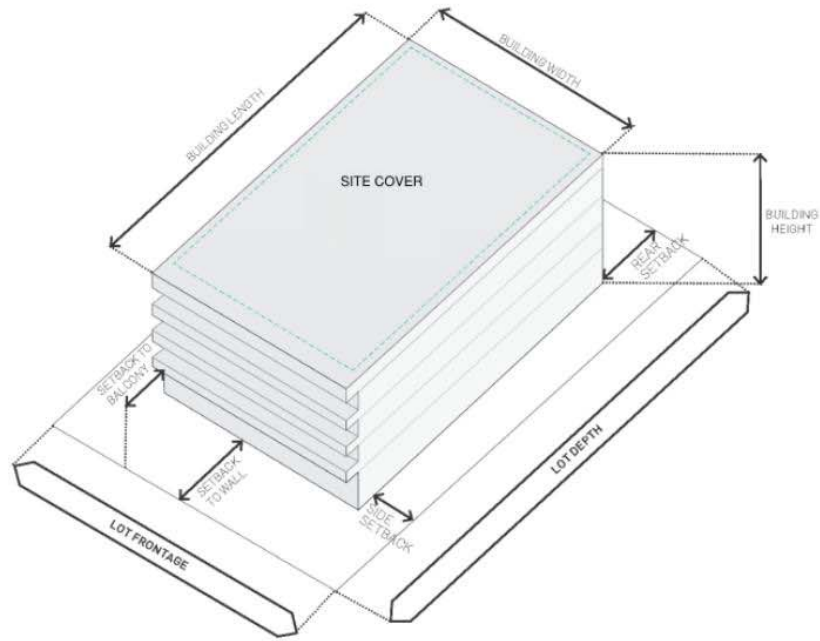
typical building envelope for a three storey apartment development
